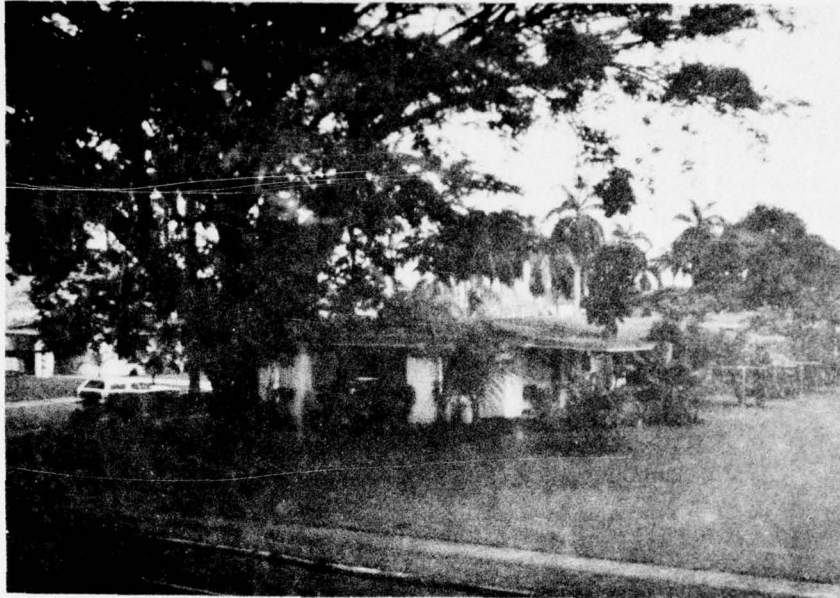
Grass growing on built-up roofing (Panama Canal Zone).
